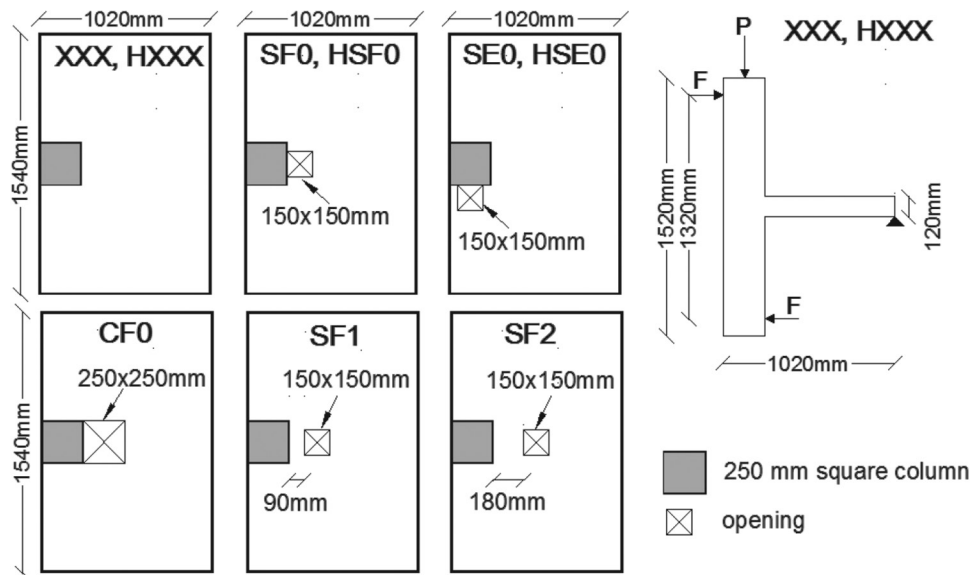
Schematic drawings of specimens with their dimensions. (Note: 1 mm = 0.0394 in.).
